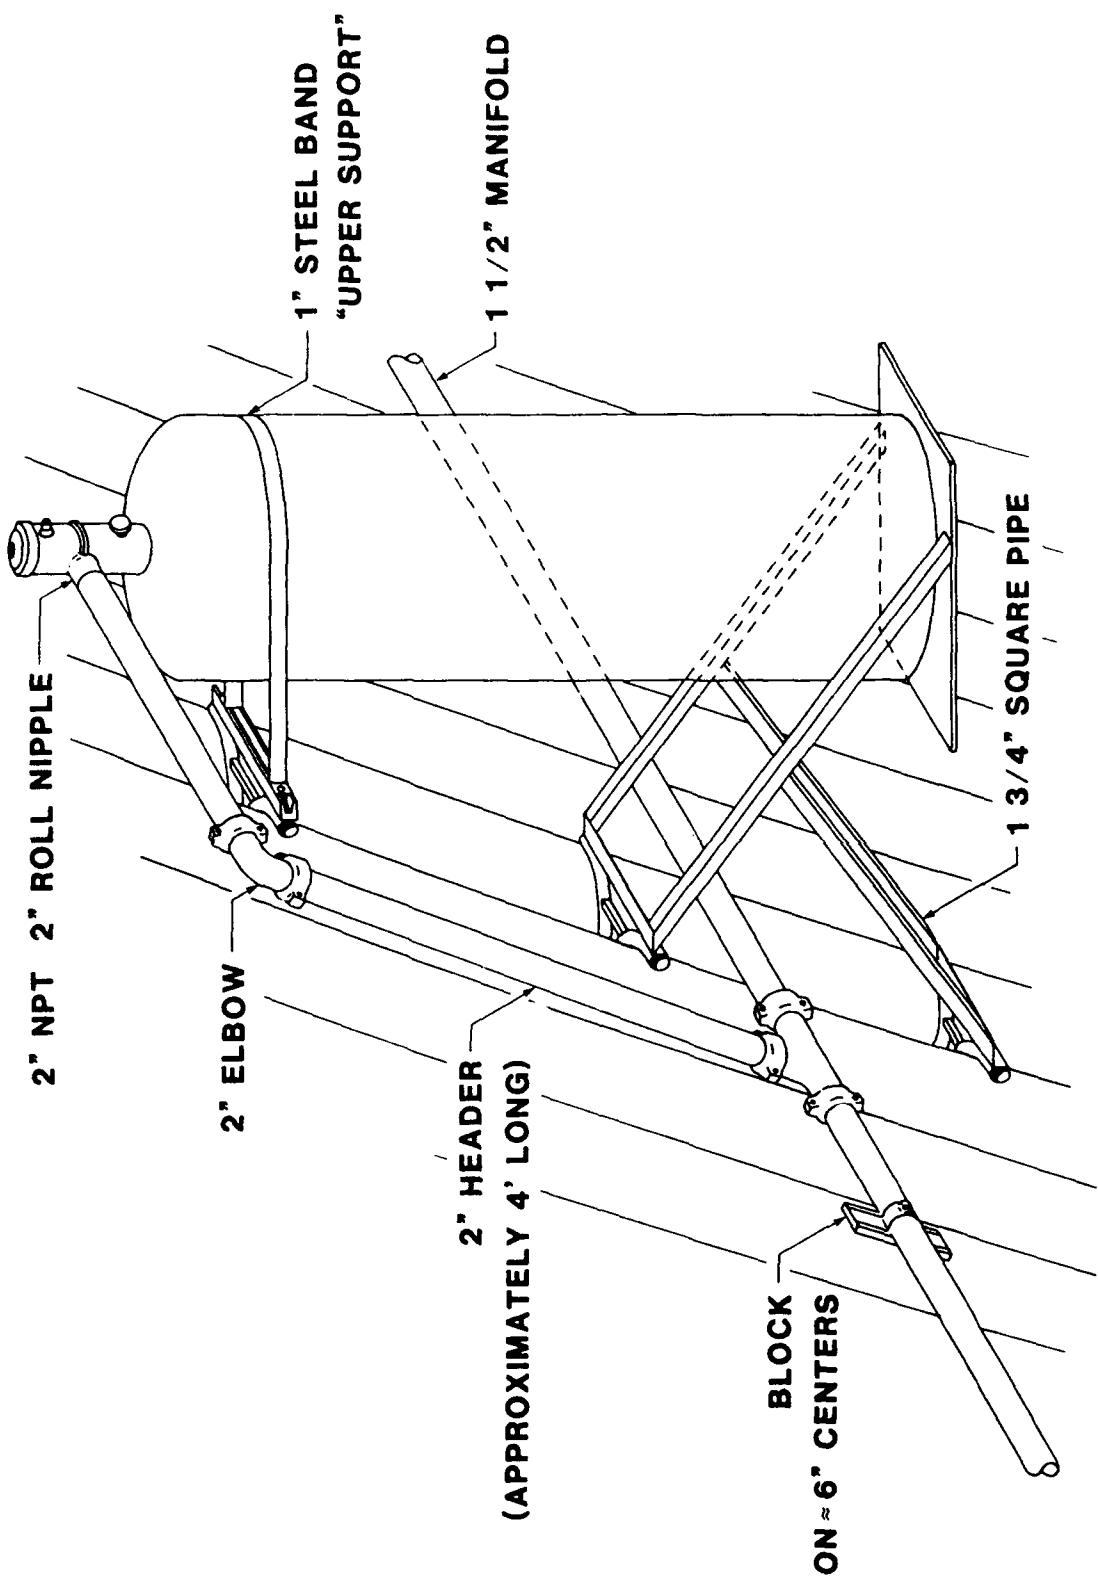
Company 'A' Cylinder/Header/Manifold Assembly.
